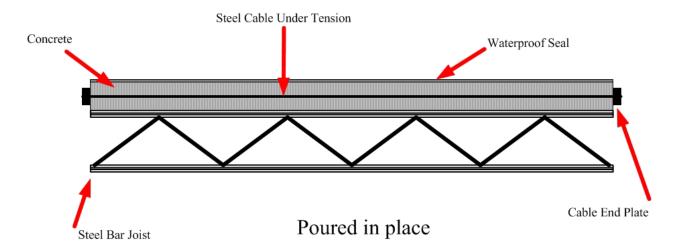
Tensioned Steel Cables Add Tensile Strength to the Concrete Floor
